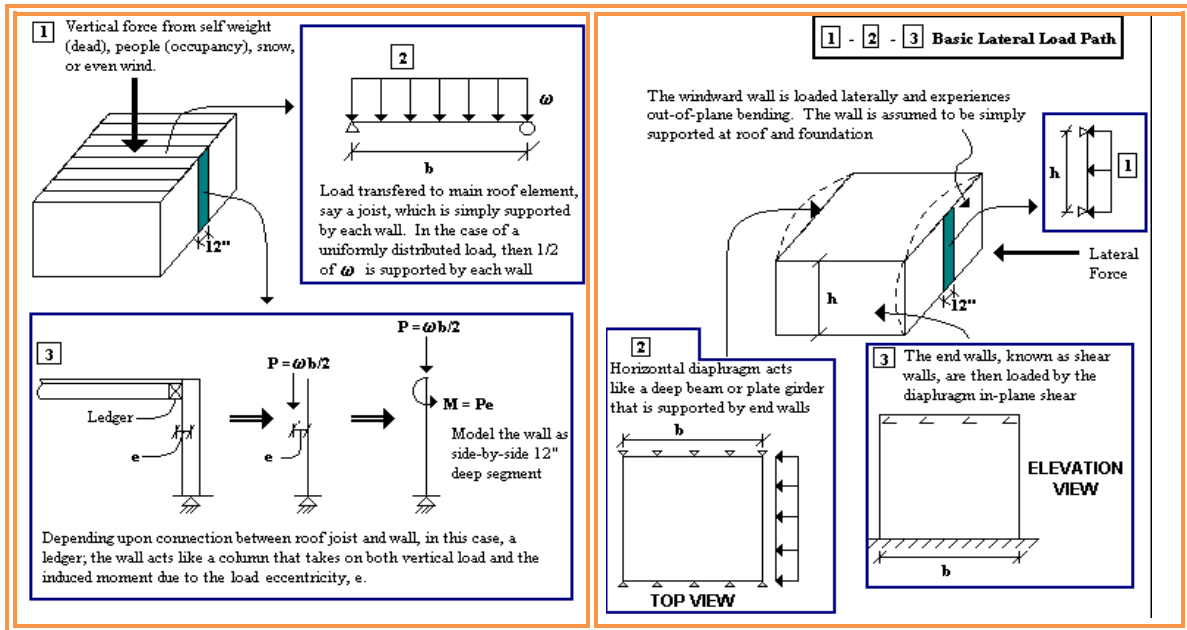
load path mechanism of vertical load and horizontal load(unknown)
